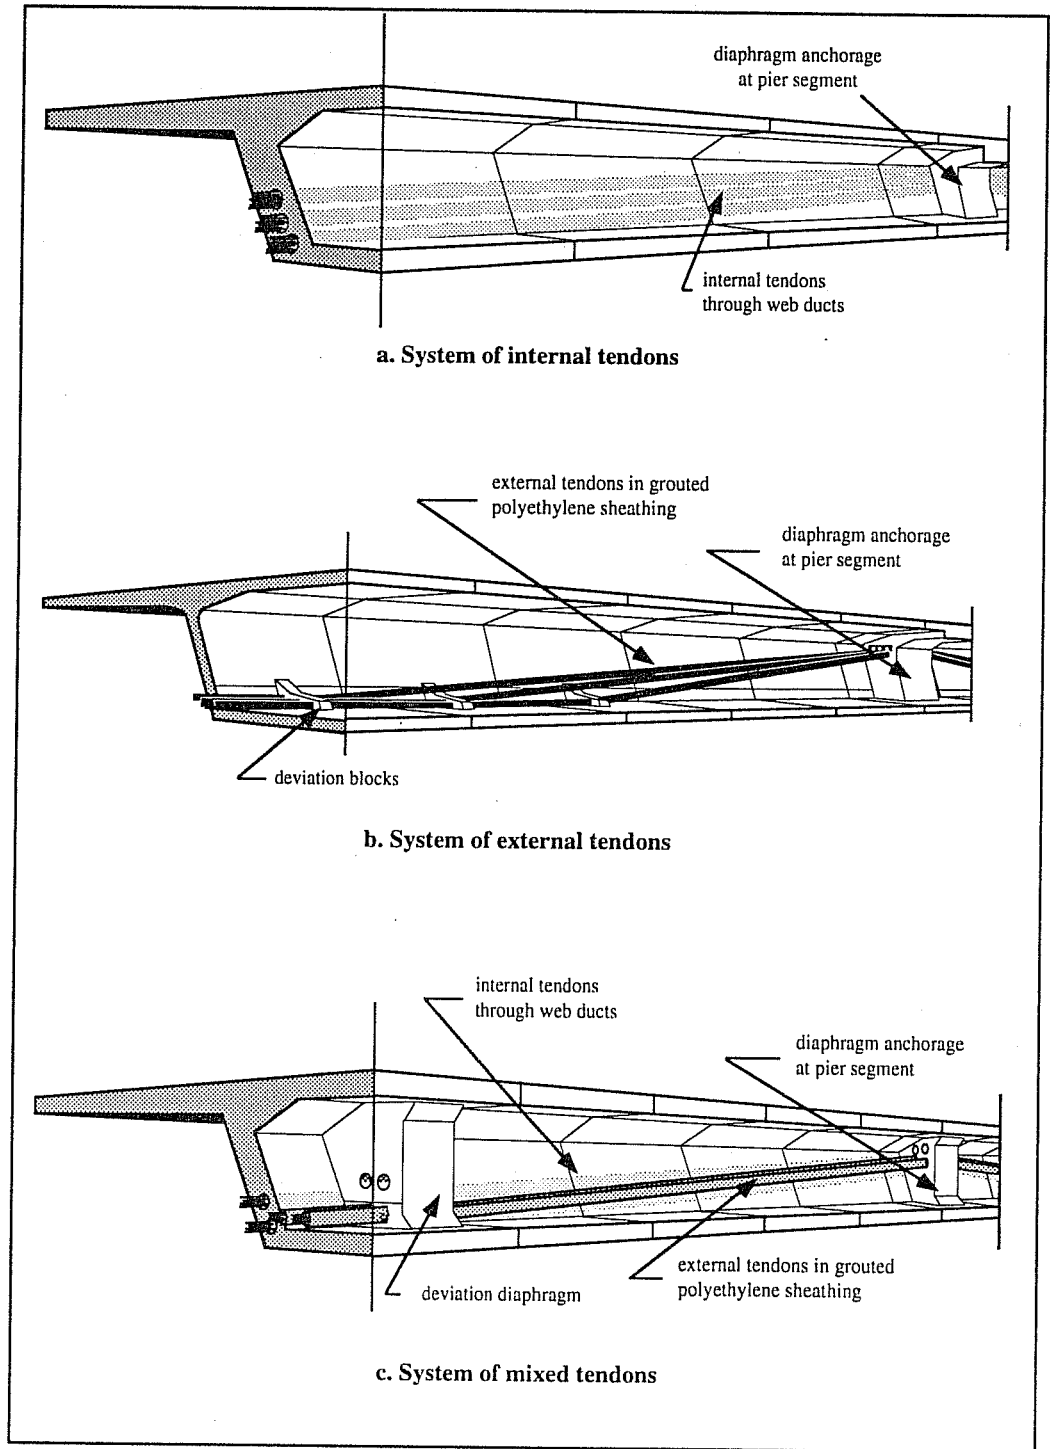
Types of construction using prestressing tendons in box girders. (from Arrellaga³)
